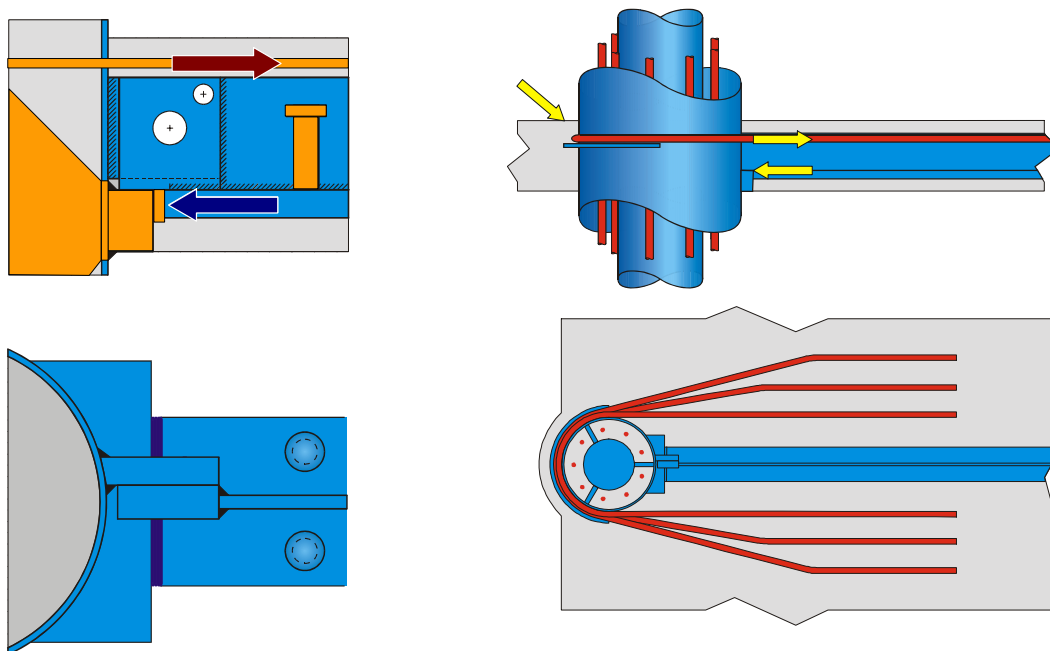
Semi-continuous moment connection between the slim floors and the column tubes
